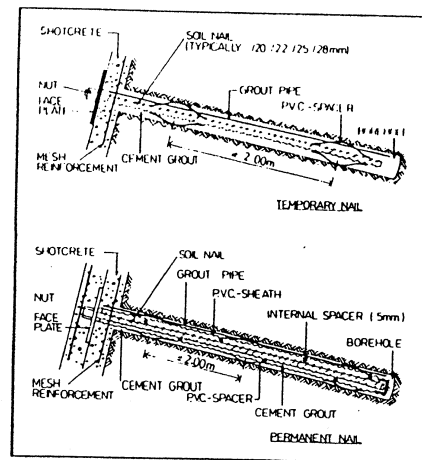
Examples of good practice for drilled and grouted nail installation (a) for temporary applications and (b) for permanent applications (Based on West German experience, reproduced with permission of Bauer, AG)
